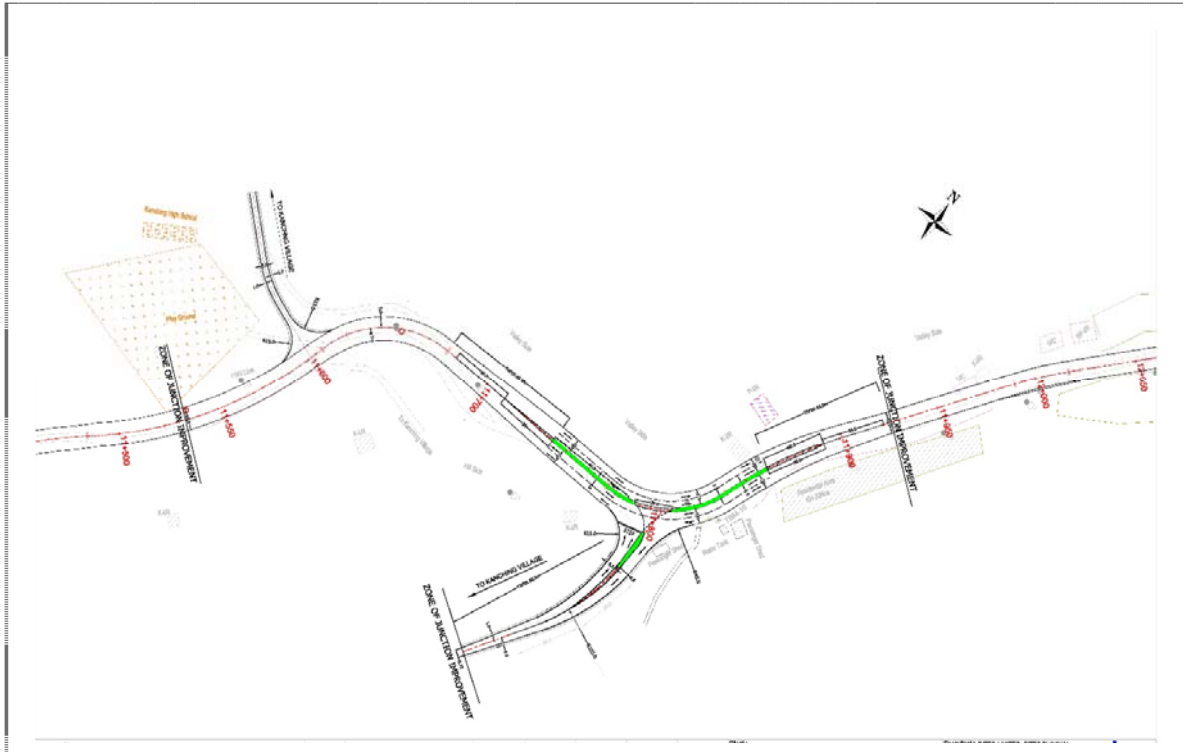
Junction Improvement at km 11+800 on M T M Road
